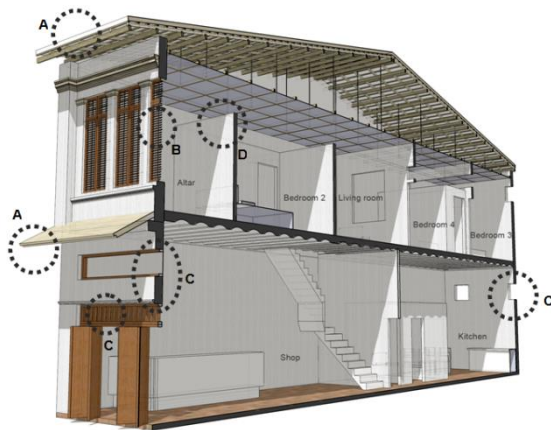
A typical section of the ancient shophouses in Cho Lon (A - Roof overhang, B - Outer wooden shutters, C - Above windows + lattice wood screen, D - Low partition walls)
